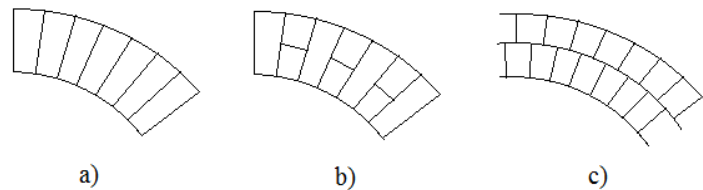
a) Single-ring voussoir arch. b) Header-bonded construction. c) Multi-ring arch
